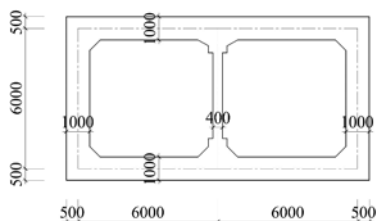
Cross-section of rectangular tunnels (unit: mm).
